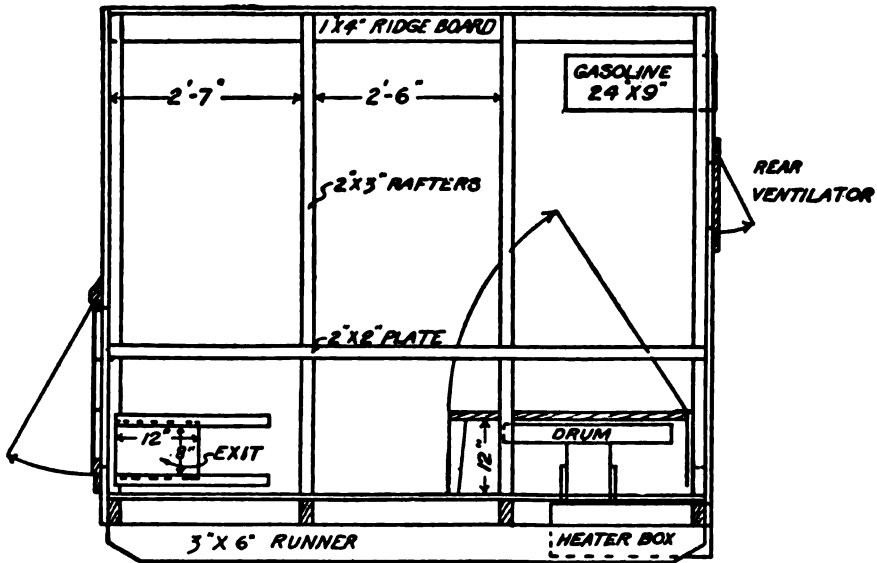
Side elevation of the colony brooder-house, showing the distance between rafters and sills. Note the bevel at the ends of the runners, making it possible to haul the building from place to place
